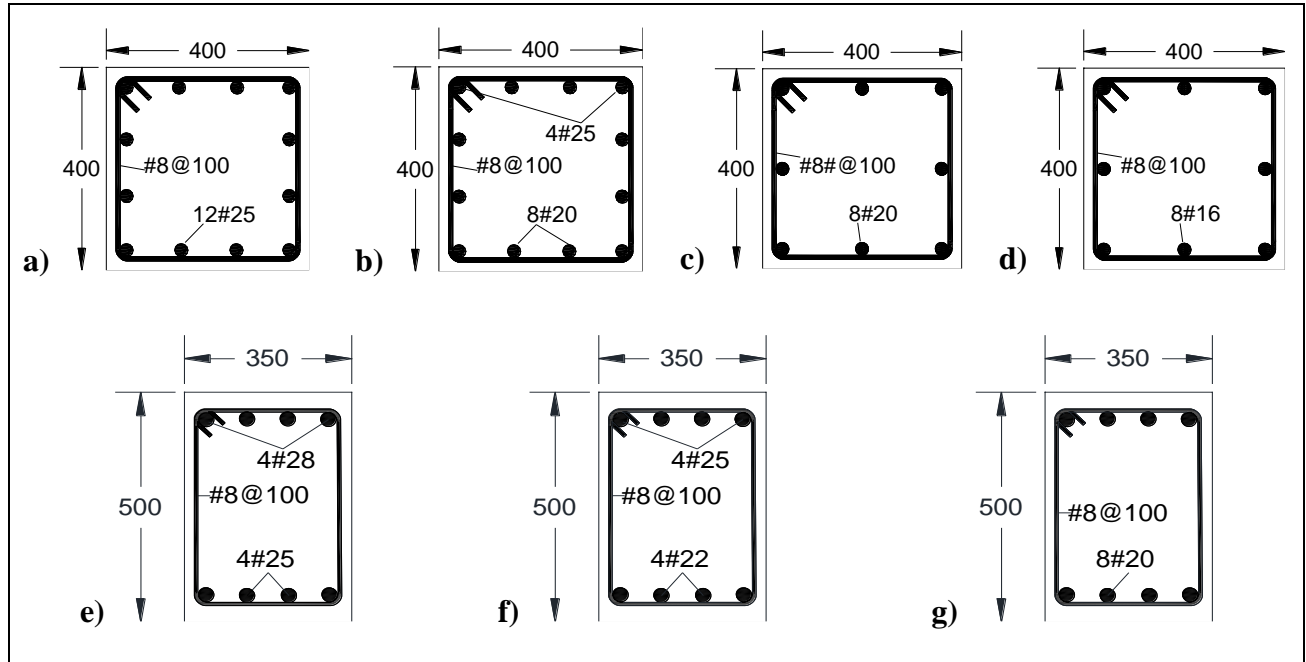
Cross Section Details of VP Series (all units are in mm) a) Column of 1st floor b) Column of 2nd floor c) Column of 3rd floor d) Column of 4th and 5th floor e) Beam 1st floor f) Beam of 2nd and 3rd floor and g) Beam of 4th and 5th floor.
